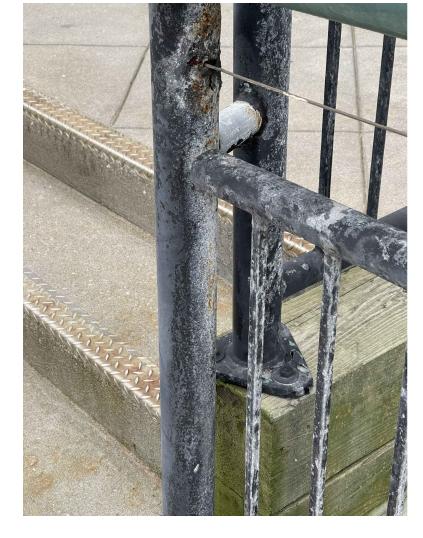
OPEN AREA #3 DETERIORATED HANDRAILS
